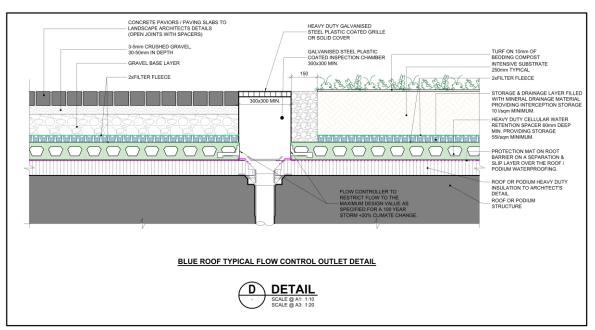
Intensive Green Roof Detail with blue roof storage & outflow control
